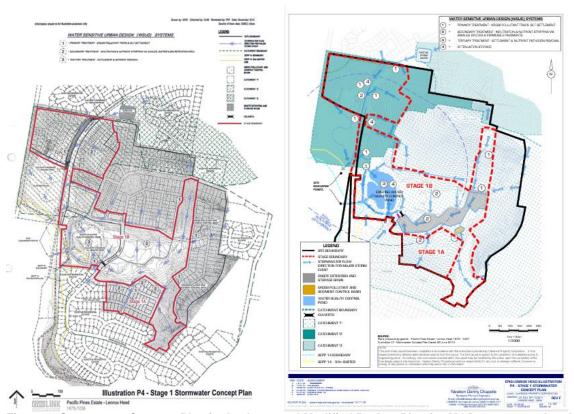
Stormwater Concept Plan in the Approved Modified Project Plan for MOD 4 compared to the one labelled P4- Stage 1 Stormwater Concept Plan REV F' in the 15 June Additional Information.
